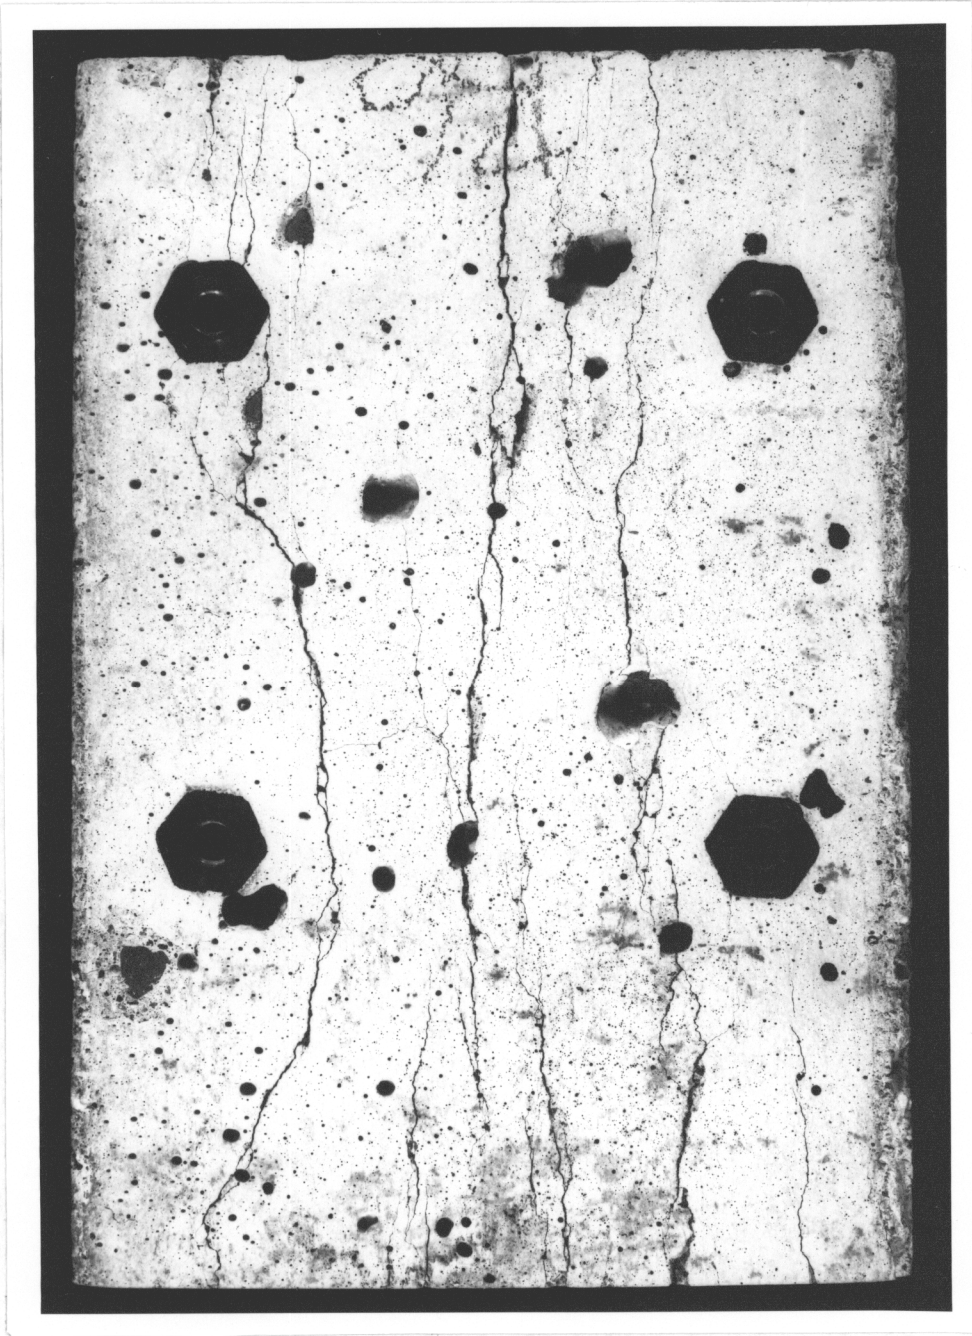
PHOTOGRAPH OF AN EXTERNAL, LONGITUDINAL SURFACE OF A PRESTRESSED BEAM
